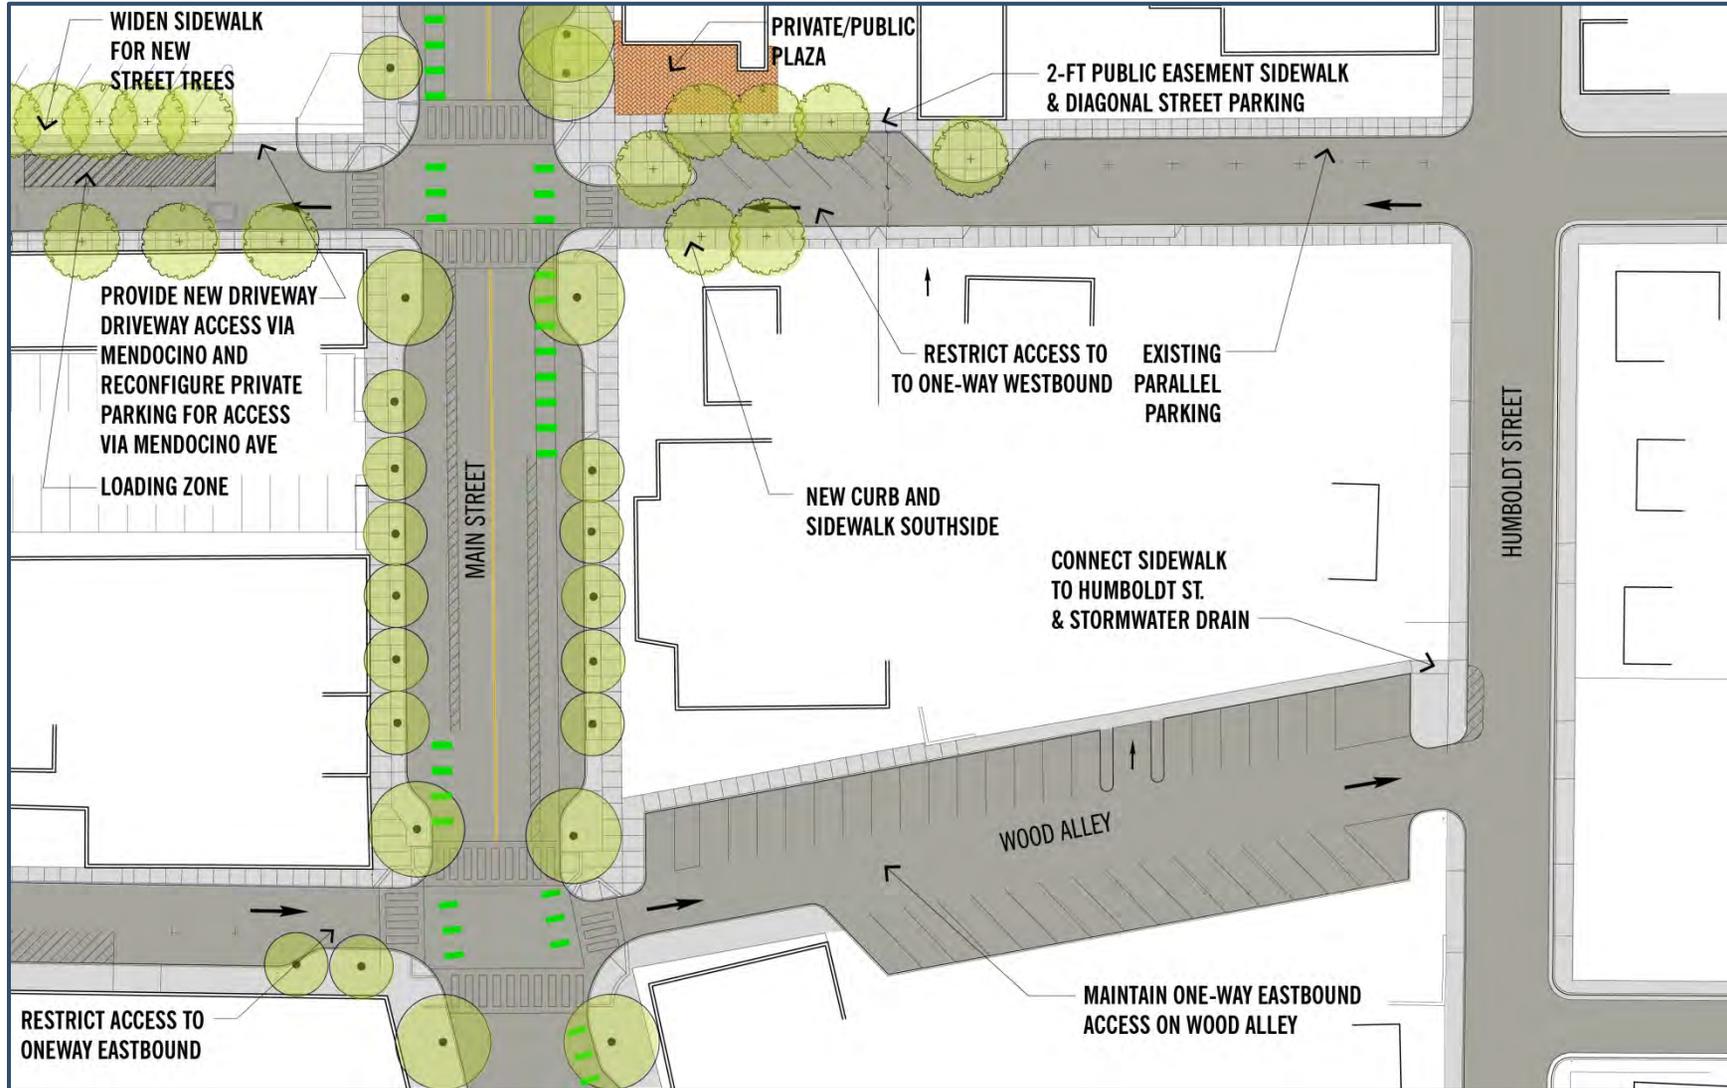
Mendocino Avenue and Wood Street/Alley Illustrative Plan
